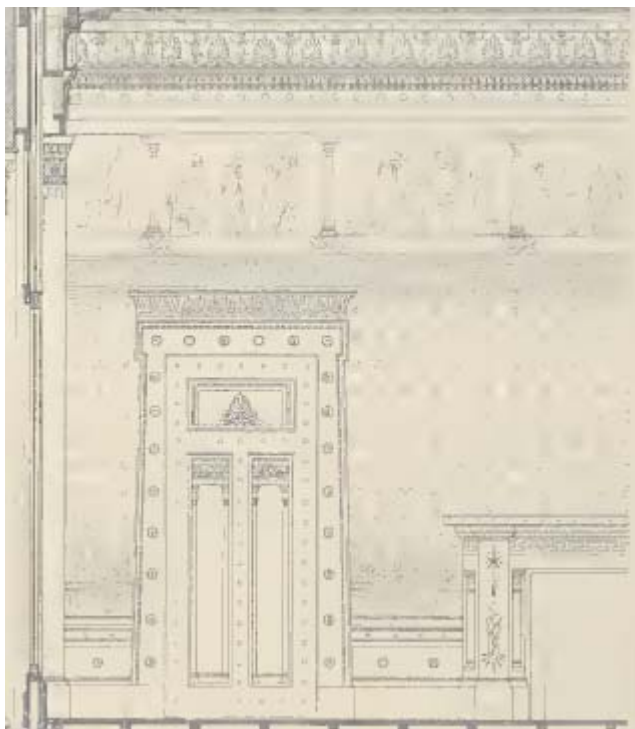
Battered, Egyptian style door surround in the 'Holmwood' dining room, and around the windows of 'Hybla' (source: Blackie 1868).
